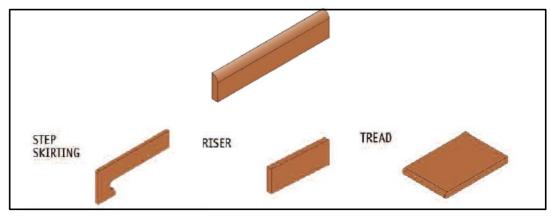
Skirting and staircase elements. (Source Lauria⁶⁶).
